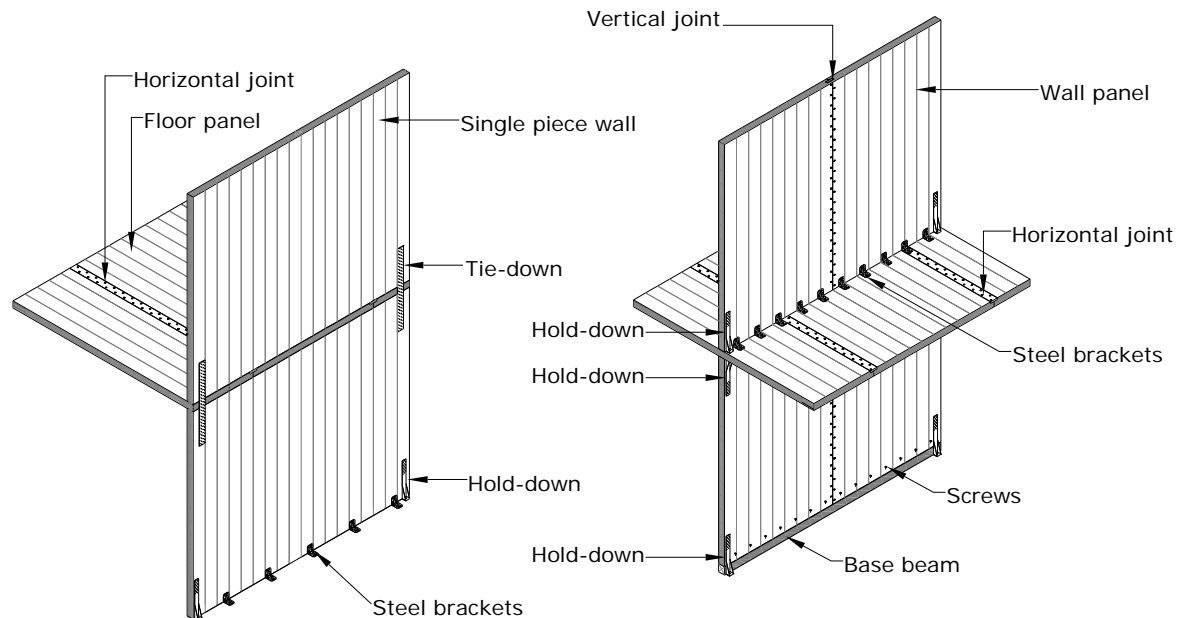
Walls and floors in platform type CLT buildings (after Follesa *et al.*, 2011)
